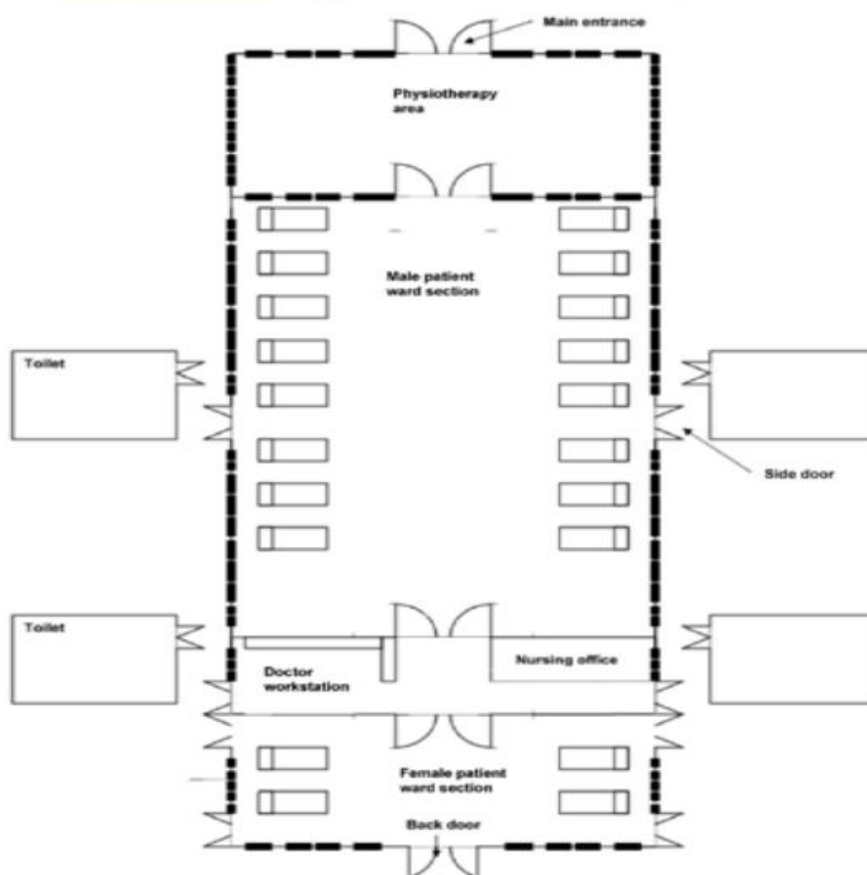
Floor plans for a tuberculosis ward. Tall ceilings, fans and multiple open windows provide good ventilation. Negative pressure rooms are not mandatory. Patients with the same infection can be cohorted in the same room – mixing with non-infected cases should NOT happen. See reference 4 for details.
